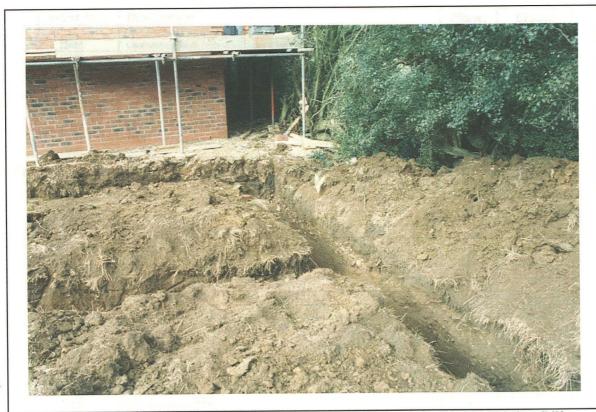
General view of south-facing section, north-west corner of Plot 7 garage, showing limestone & brick/tile dump [369] - looking north-west
